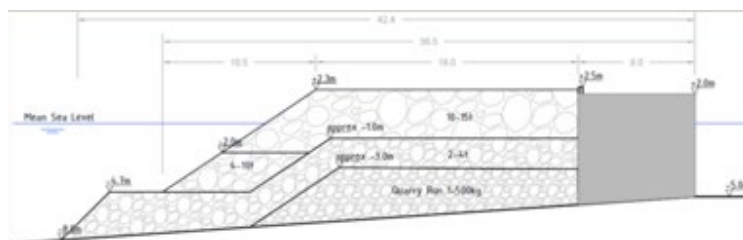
Top: section view of berm breakwater (base case). Design with block-wall at quay side (A-G)
